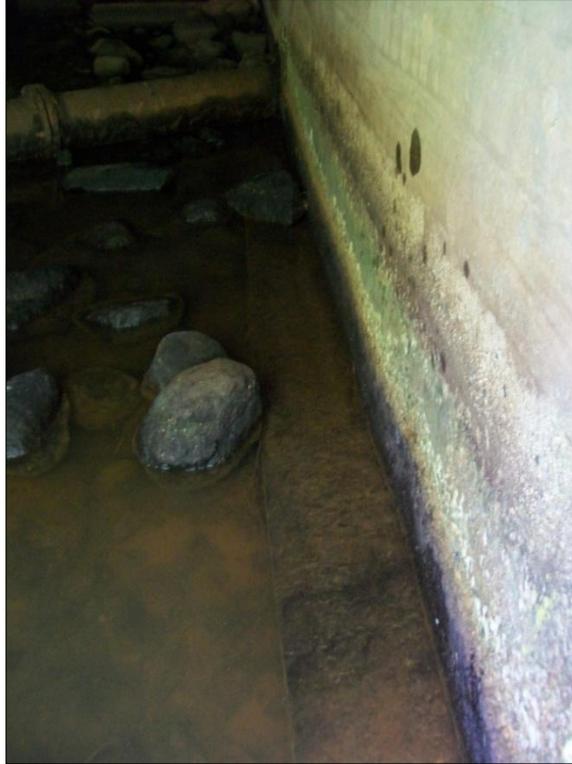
Looking West: Structure 1 North Abutment Exposed Footing
